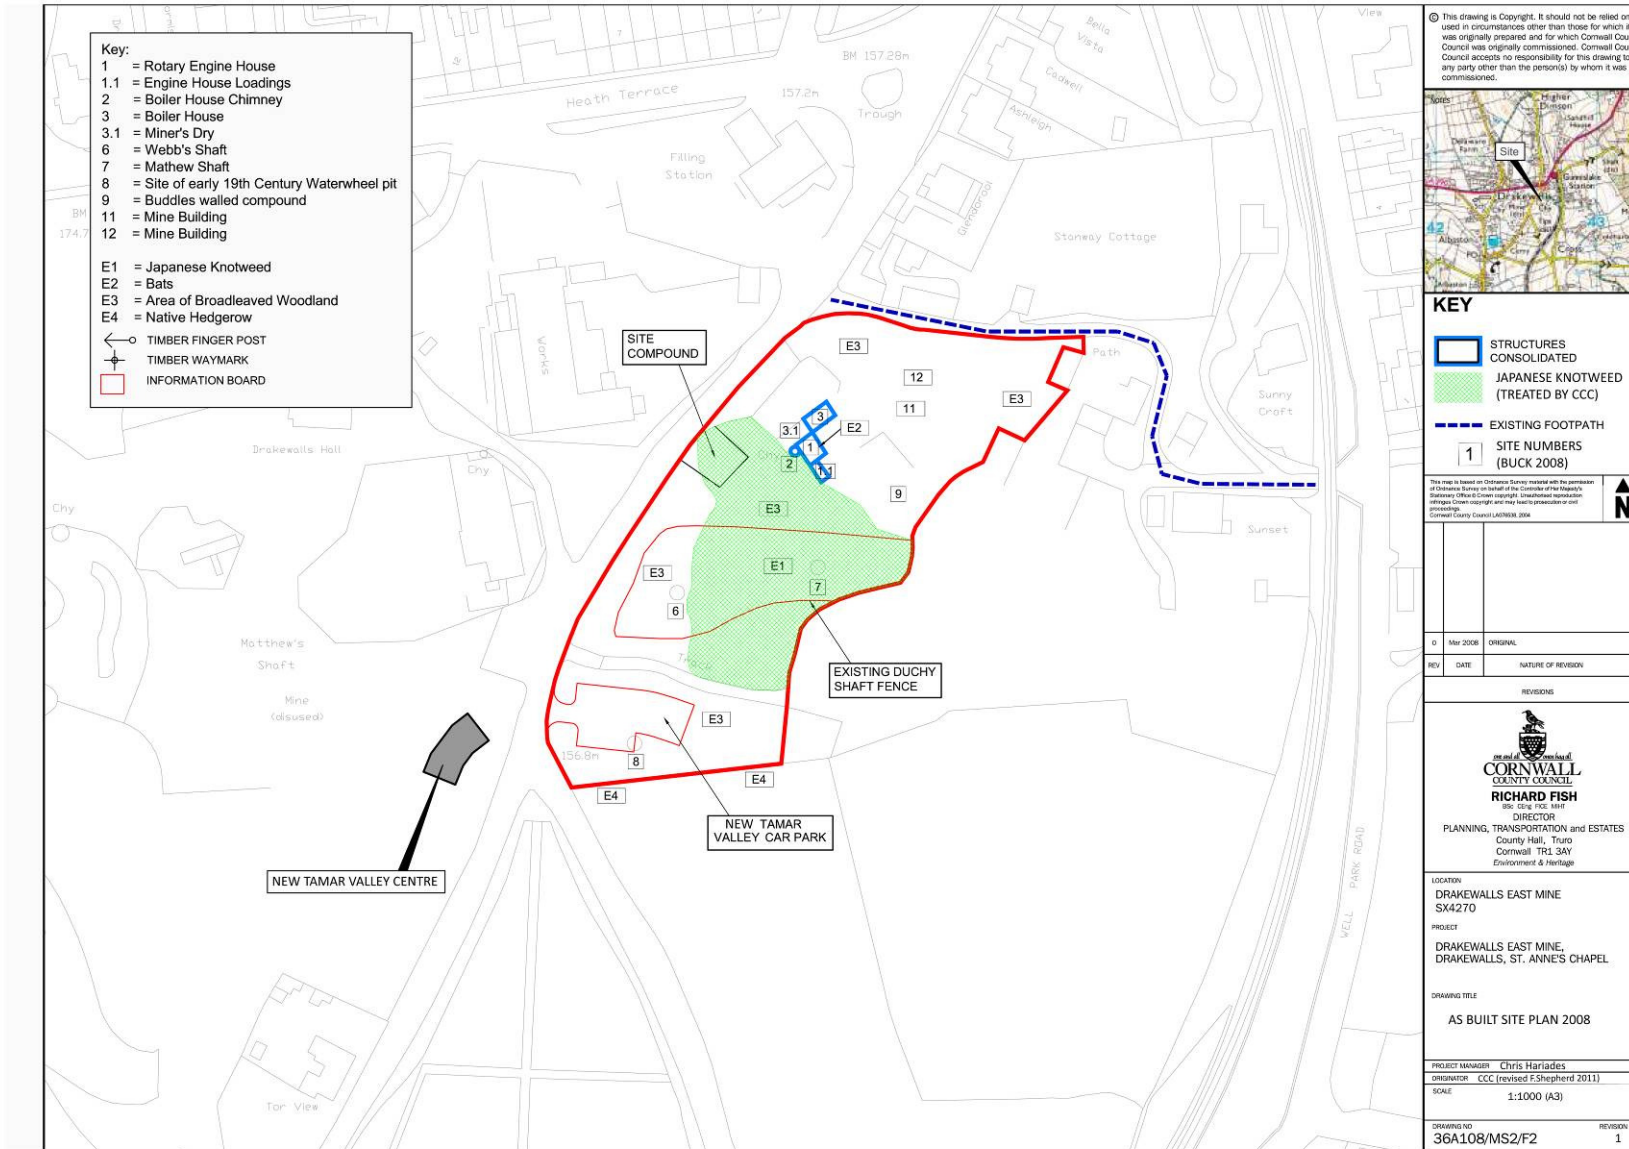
Site plan of building conservation works and the new Tamar Valley Centre
